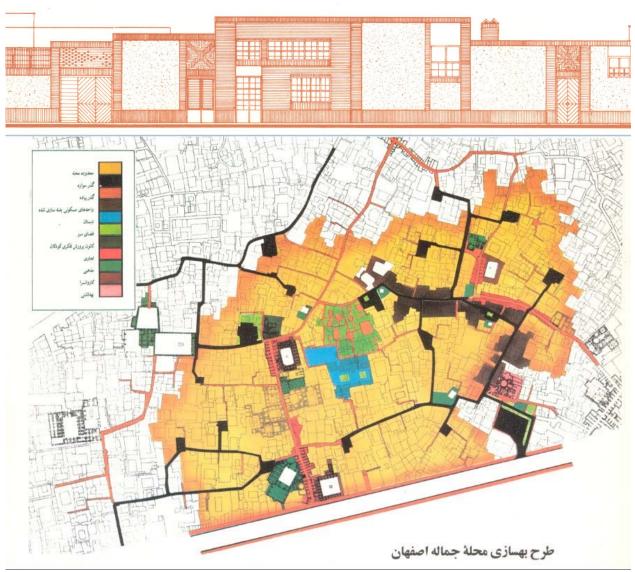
, Jamāle Plan and a sample Façade, (Sāzmān-e Nowsāzi va Behsāzi-ye Šahrdāri-ye Esfahān, 2013)
